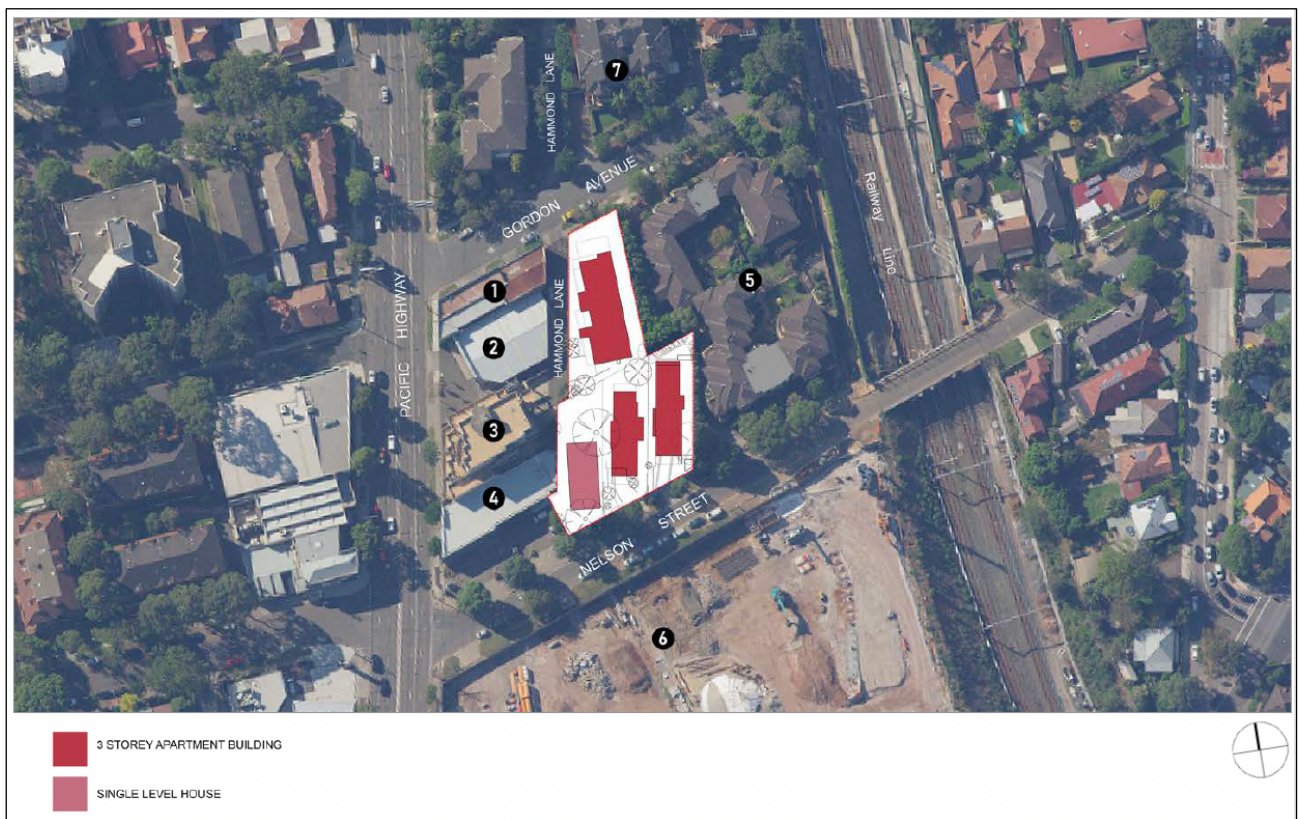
Project site and adjacent commercial and residential buildings (image courtesy of DEM)
